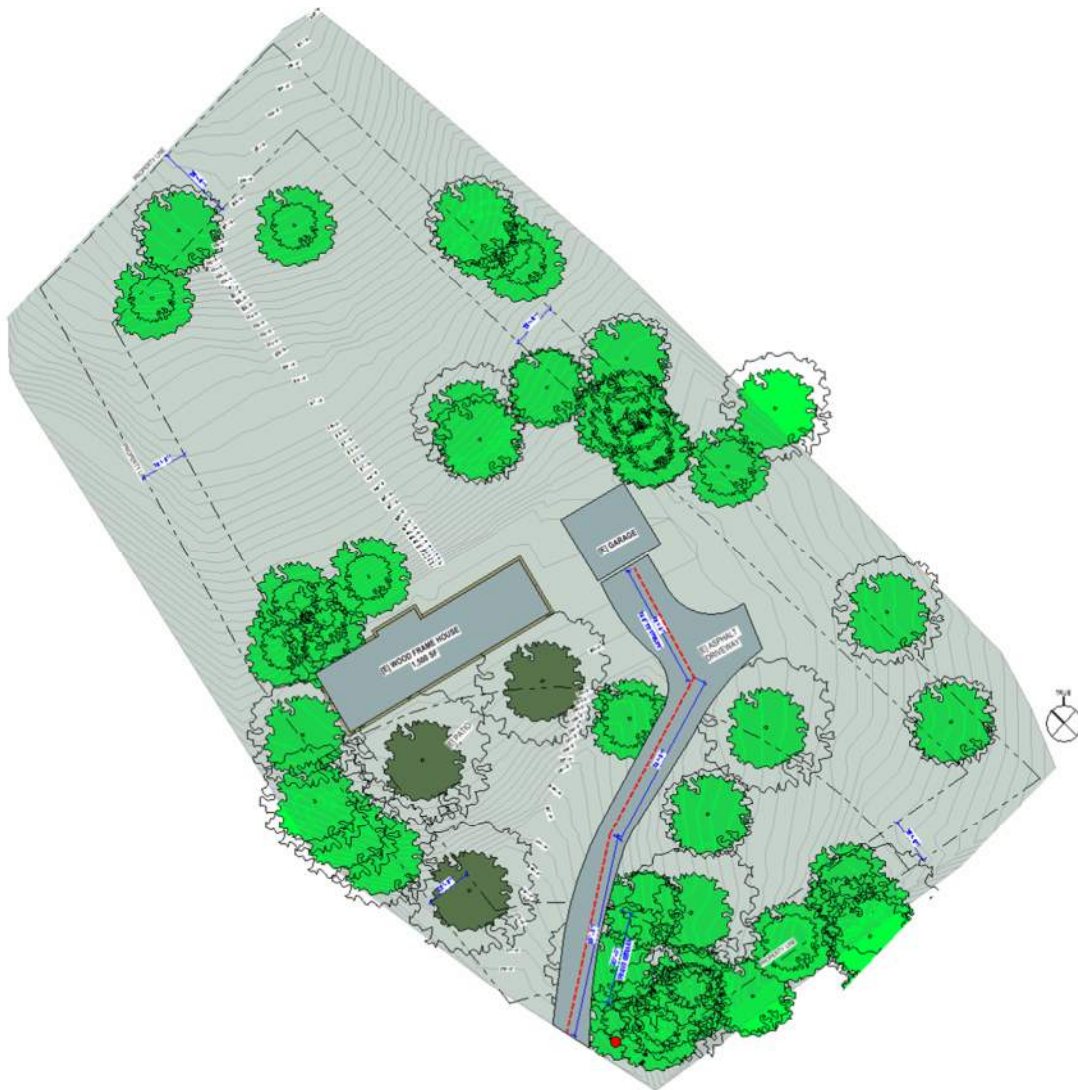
Option A with residence at existing pad. Garage location requires fire truck-turnaround and due to 100' light and air easement, no room for yard, pool.
